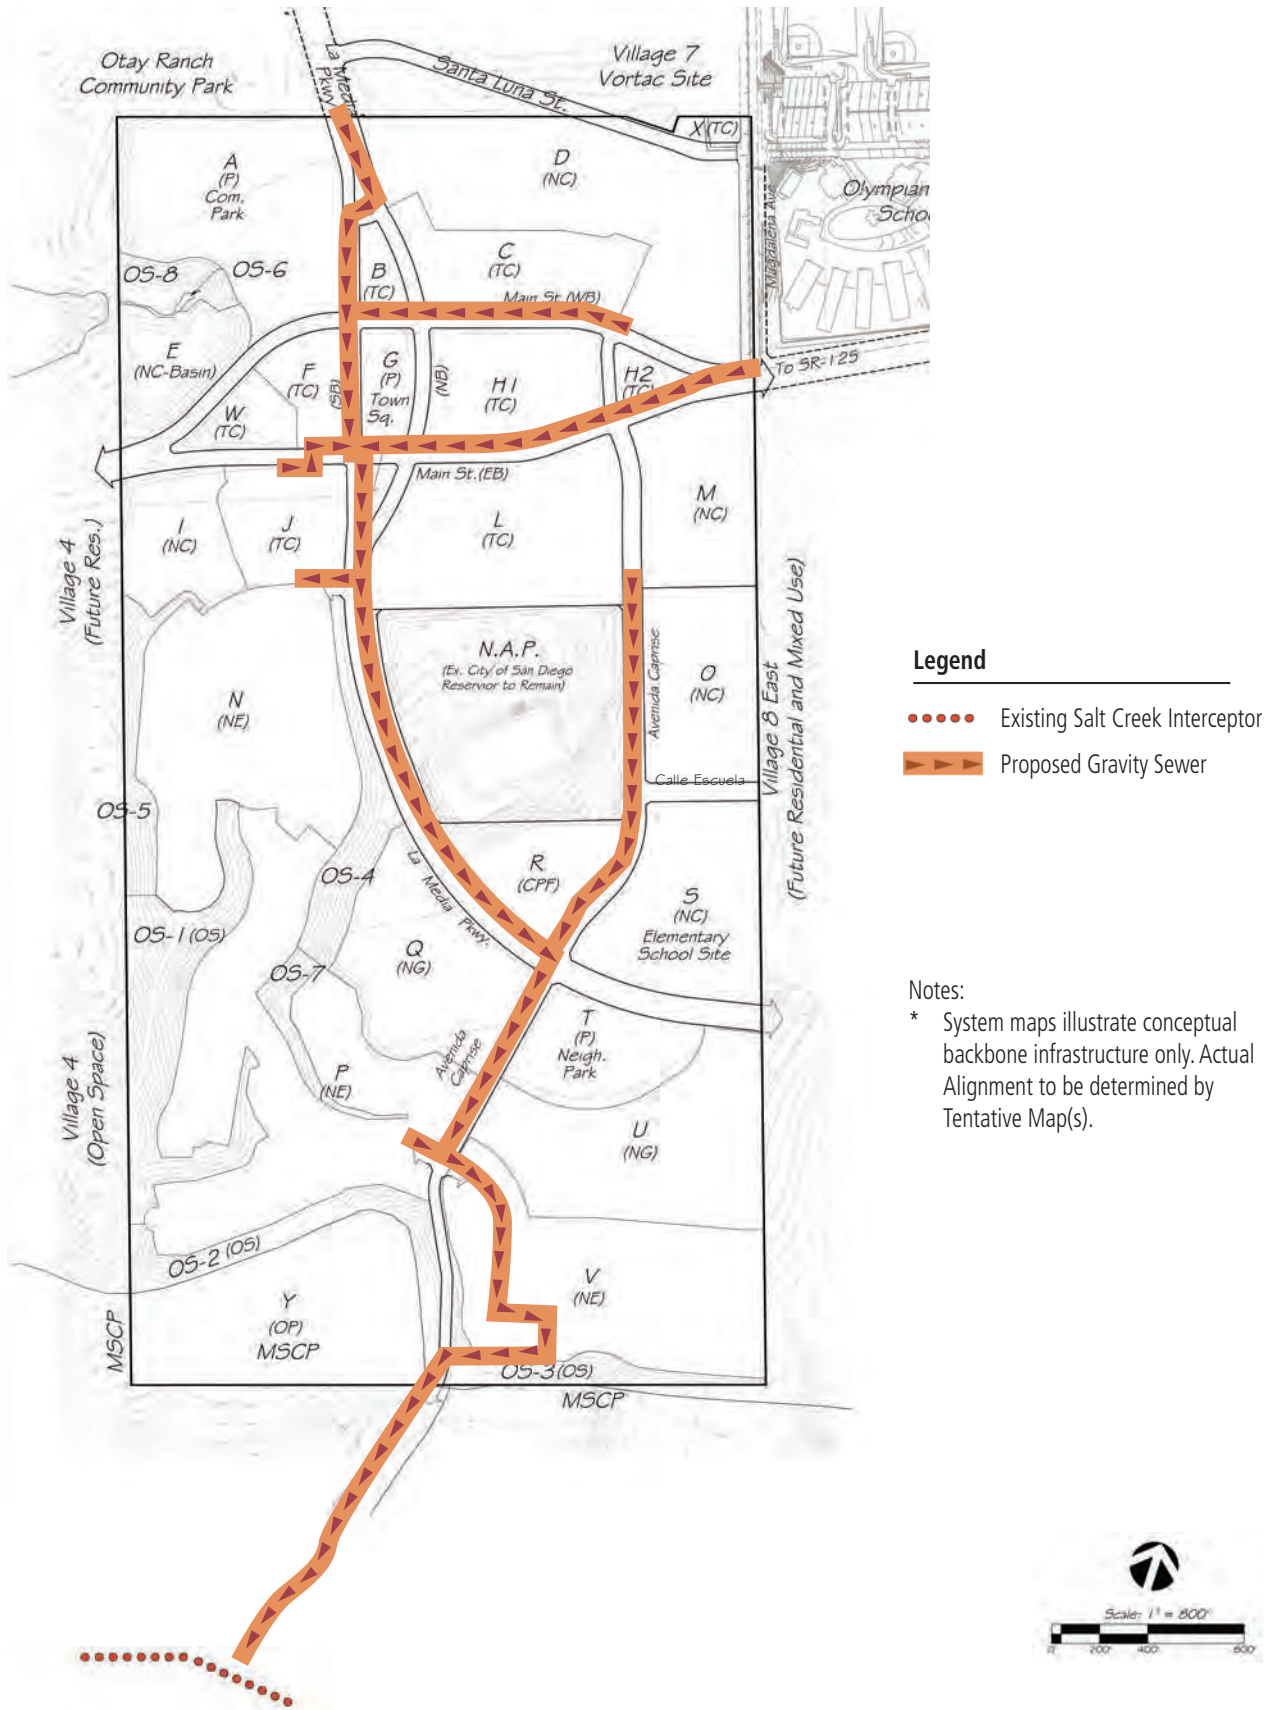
Conceptual Sanitary Sewer Master Plan
